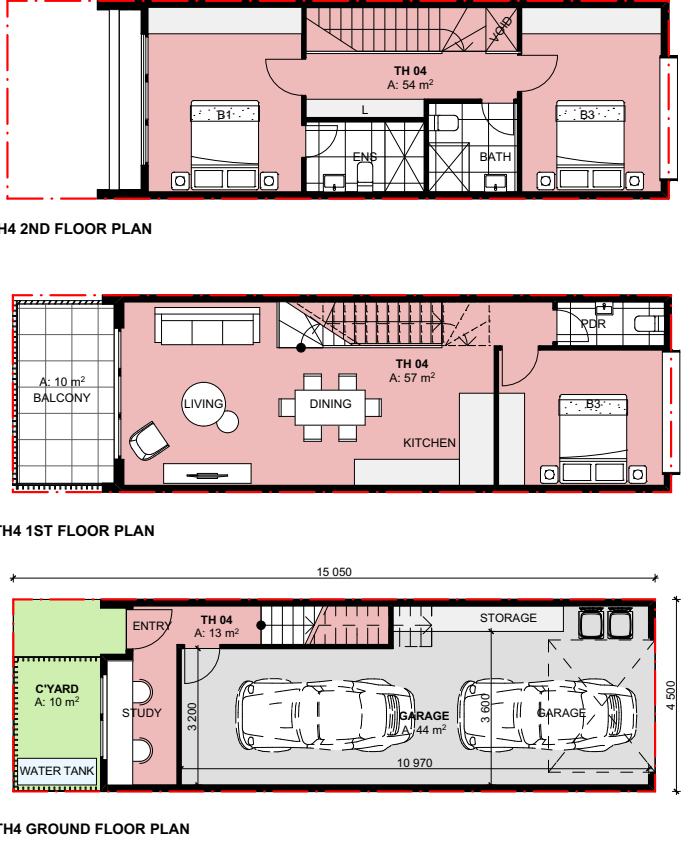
Townhouse Type 04 (Source: Plus Architecture)
